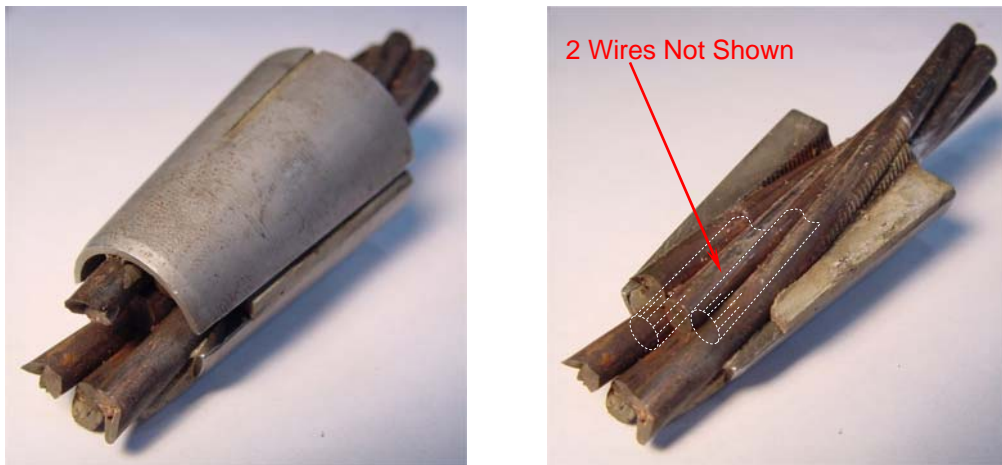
Location of Wire Breaks near Tower End – Specimen 2
